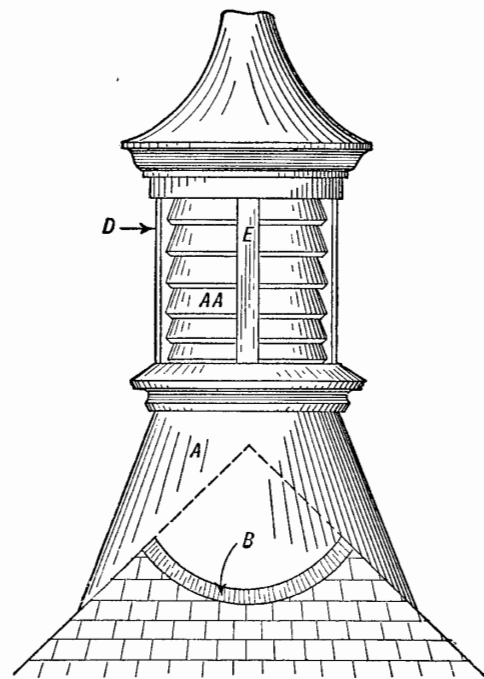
Round Tapering Ventilator on Ridge and Hips of Pitched Roof
